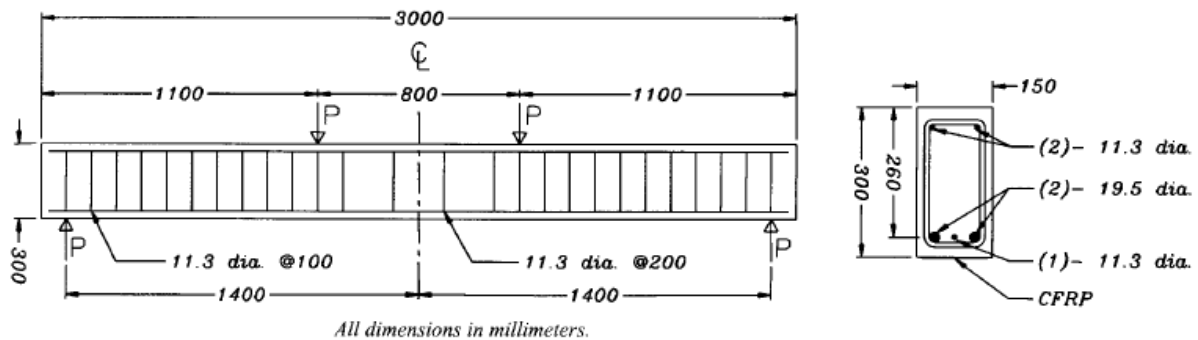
Beam dimensions and reinforcement layout (White et al, 2001)
